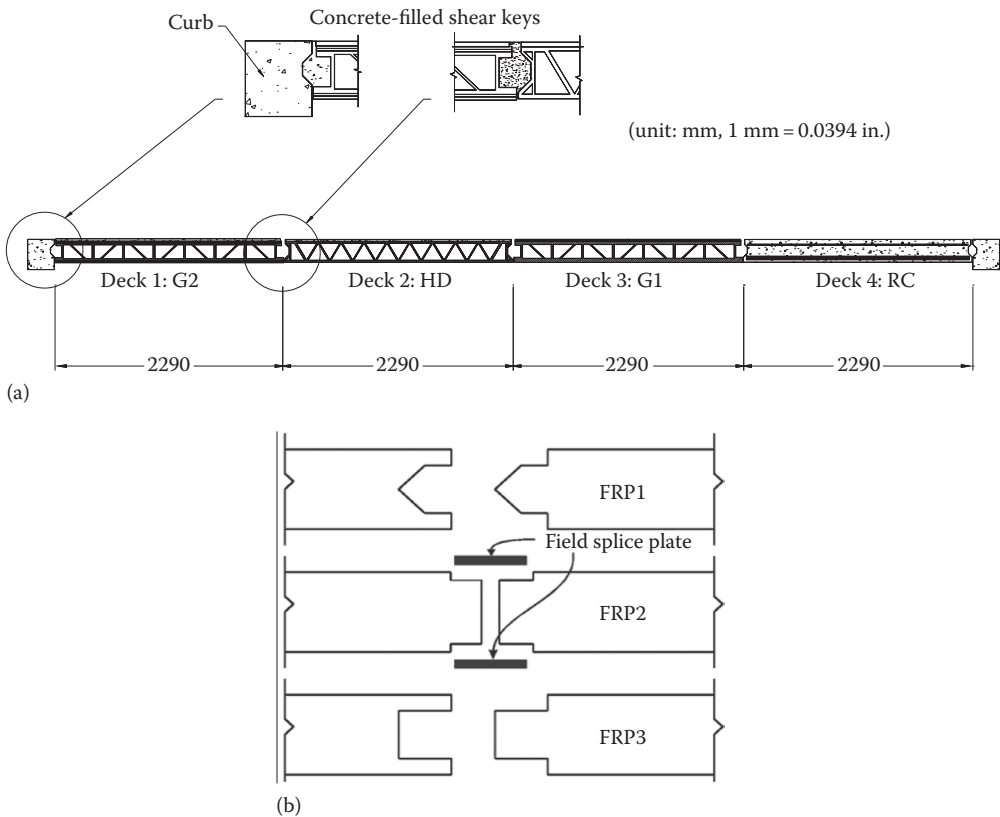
Deck-to-deck connections. (a) Grout shear keys (From Lopez-Anido, R., Wickwire run bridge: First FRP-deck on steel-stringer bridge, 1998, <http://www.umeciv.maine.edu/rla/>, accessed on January 16, 2006) and (b) deck interlocking. (From Righman, J.E. et al., *ASCE J. Compos. Constr.*, 8(4), 279, 2004.)
